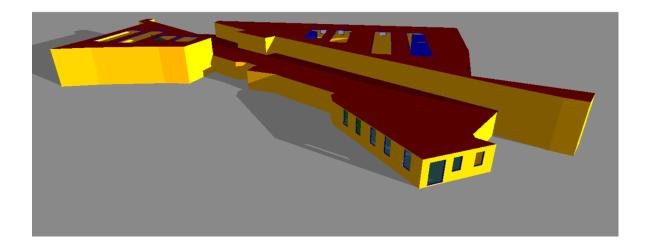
3D model of building geometry (Grafton Road elevation)
